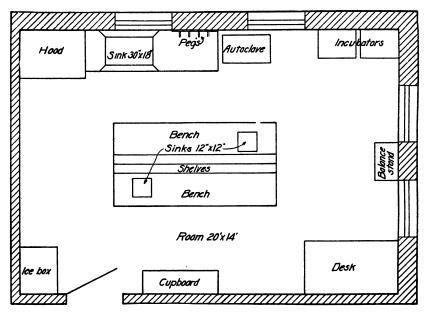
Plan Showing an Arrangement of Furniture in Small Water Works Laboratory.
